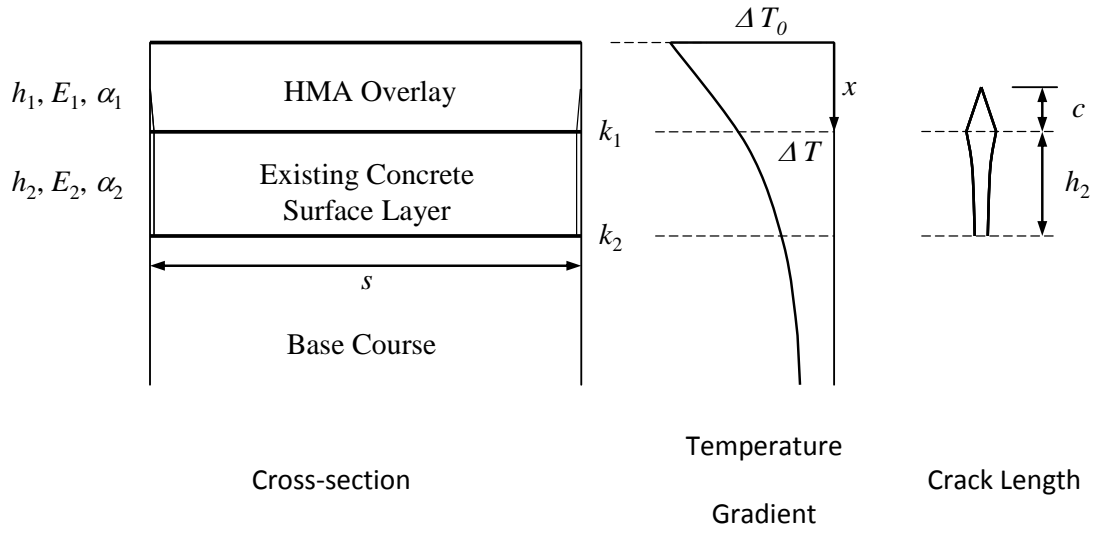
Diagrams of HMA overlay on jointed concrete pavement-thermal.
